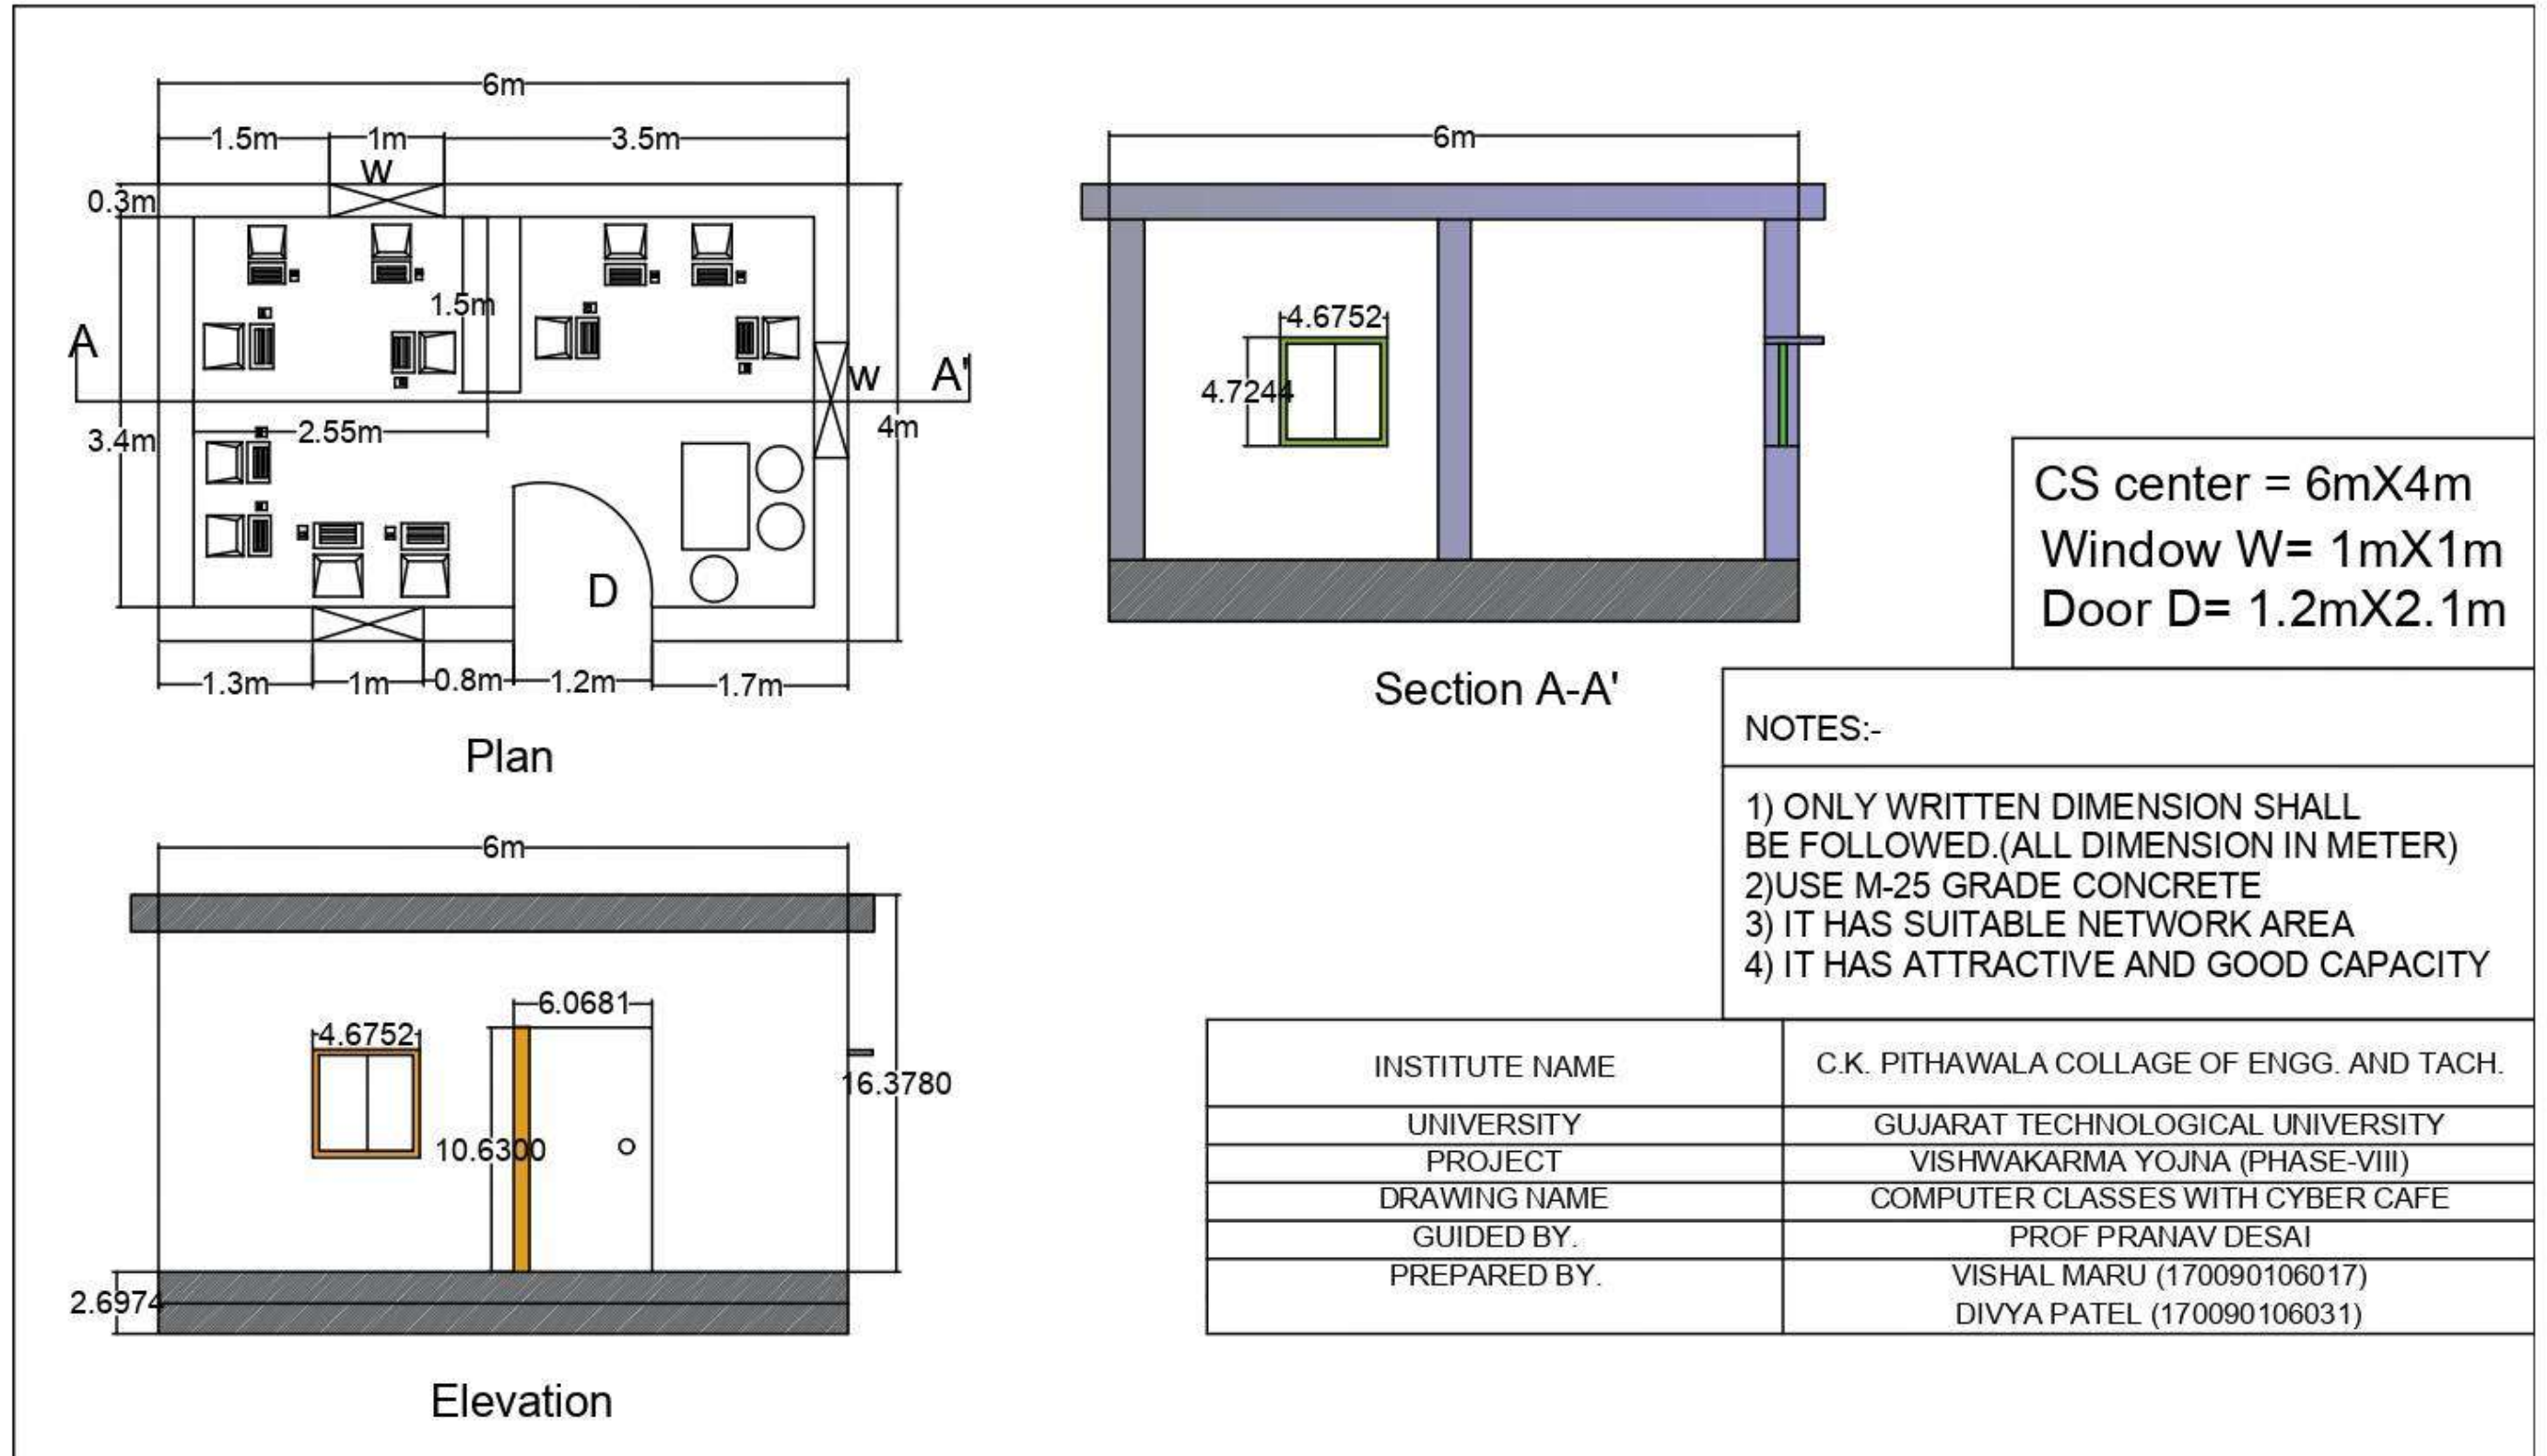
Plan, Section, Elevation of Computer Classes with Cyber Café
